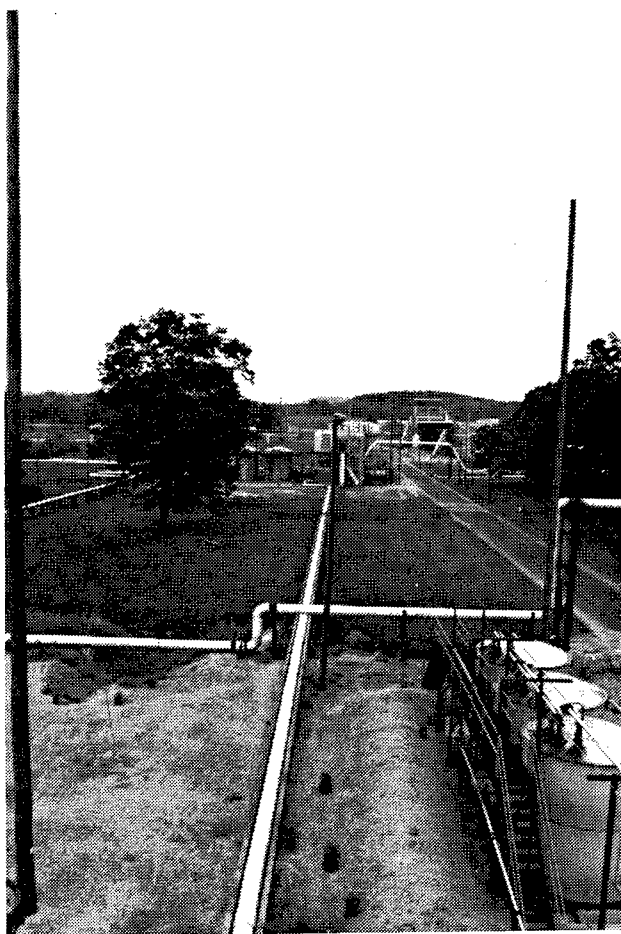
Building G2: View of Pipeline extending from Building E2 to Building G2. Building G2, a Purification Building, is in the background.
